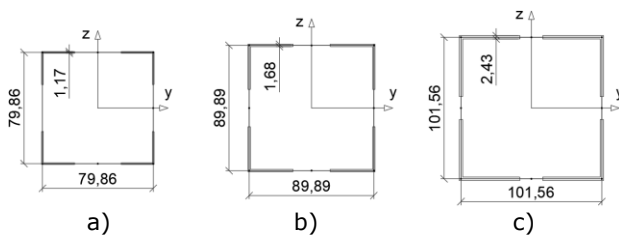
Cross-section geometry of optimized Type A column: a) – column under 50 kN axial load; b) – column under 100 kN axial load; c) – column under 200 kN axial load
